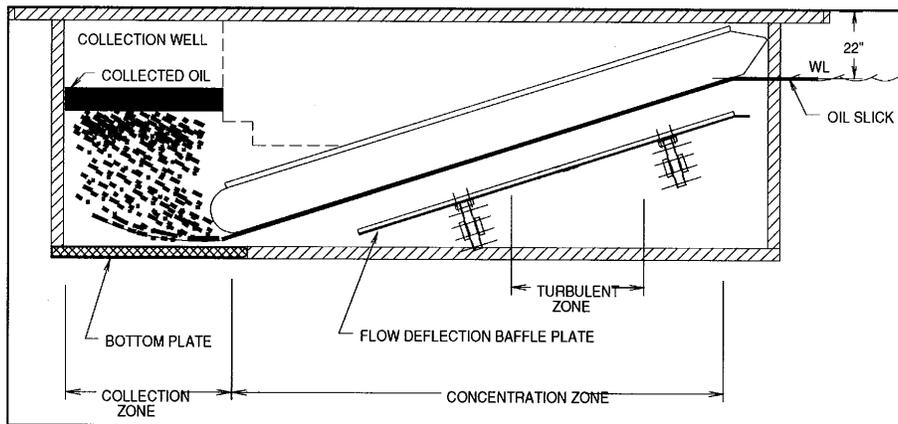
Cross-section of the HSS with Baffle Plate Installed.
